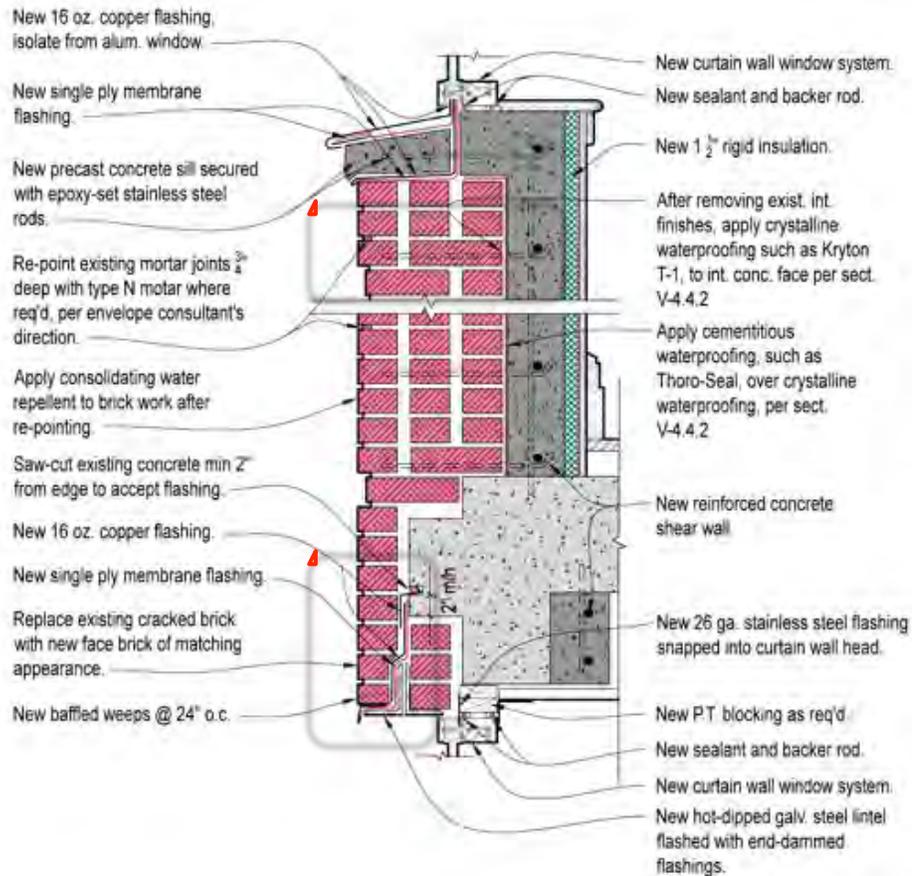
(2): Brick Anchorage and Lintel Flashings at Brick Walls
